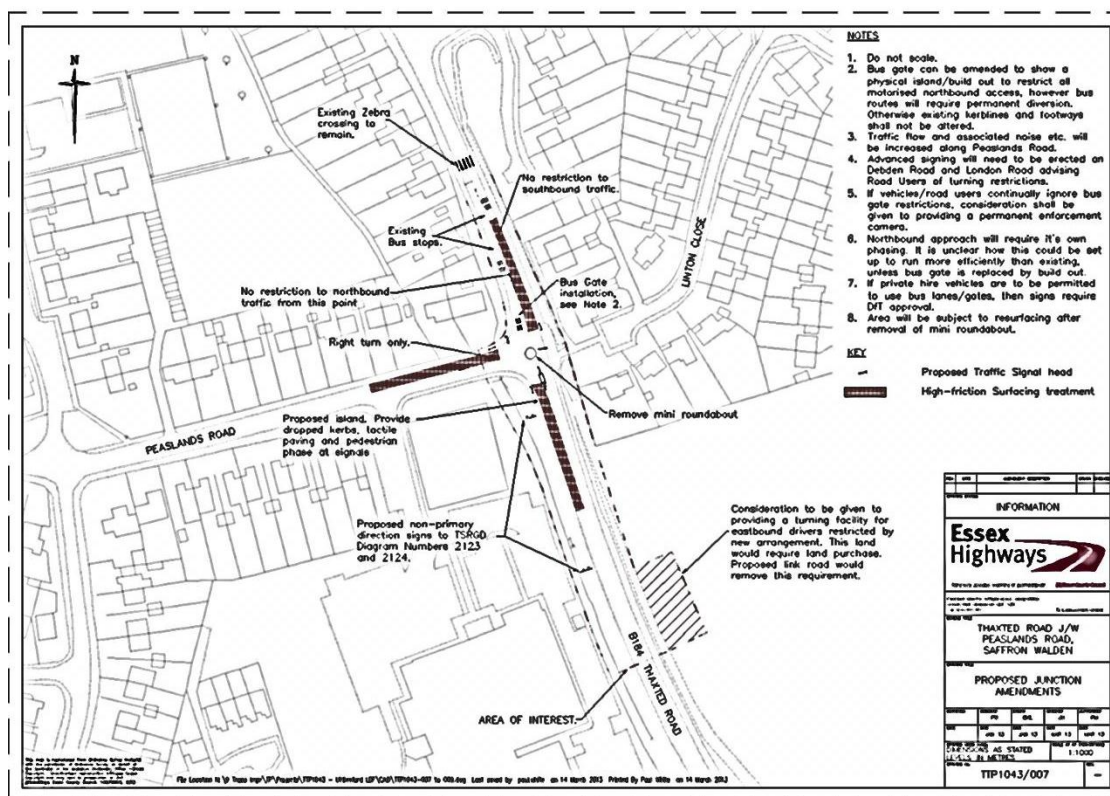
Thaxted Road / Peaslands Road junction with signalised layout (MM4)
